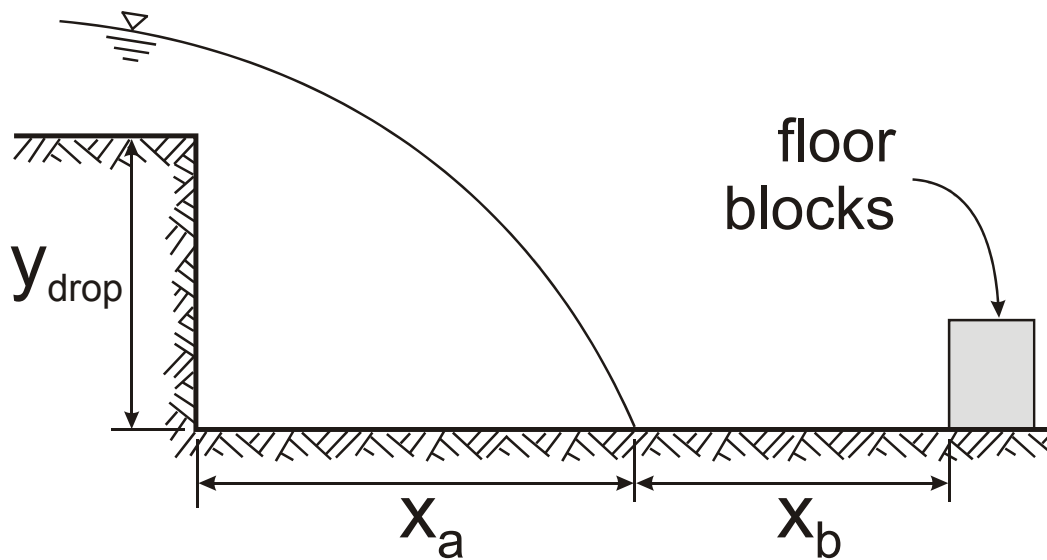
Side view of a drop spillway showing the recommended location of floor blocks (flow is from left to right)
